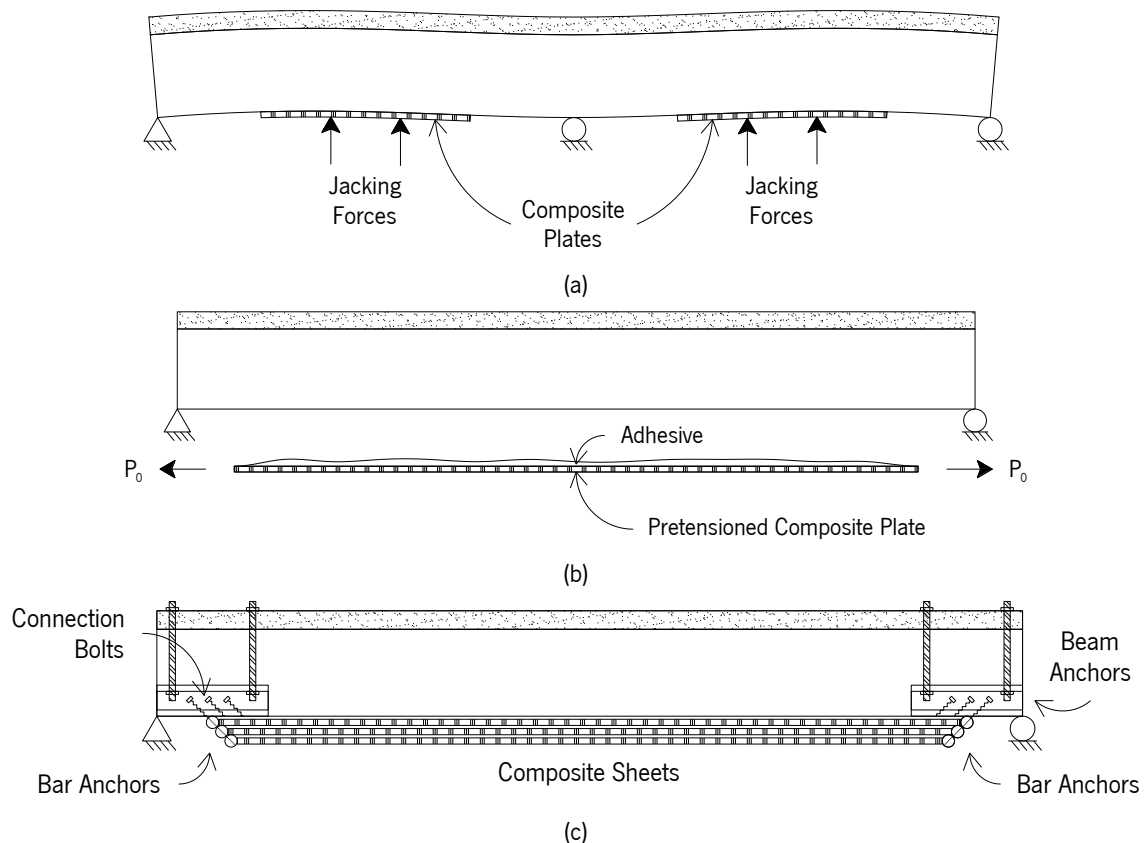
EBR prestress strengthening systems reported on literature: (a) External prestressing of two-span continuous girder (Saadatmanesh & Ehsani 1991); (b) Schematic sketch of pretensioning arrangement (Deuring 1993 and Meier 1995); (c) FRP Prestressing System (Wight *et al.* 2001)
